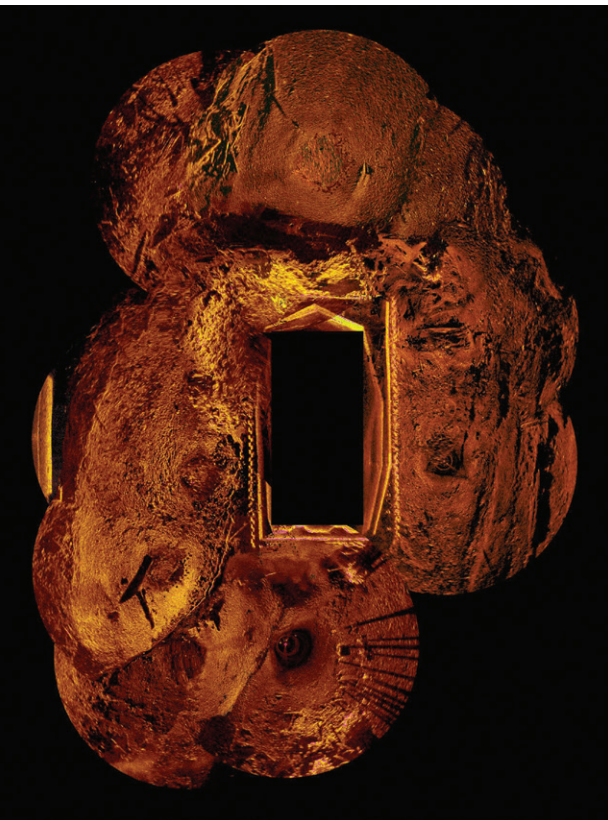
Plan view mosaic of channel bottom surrounding bridge pier using sector scan.
